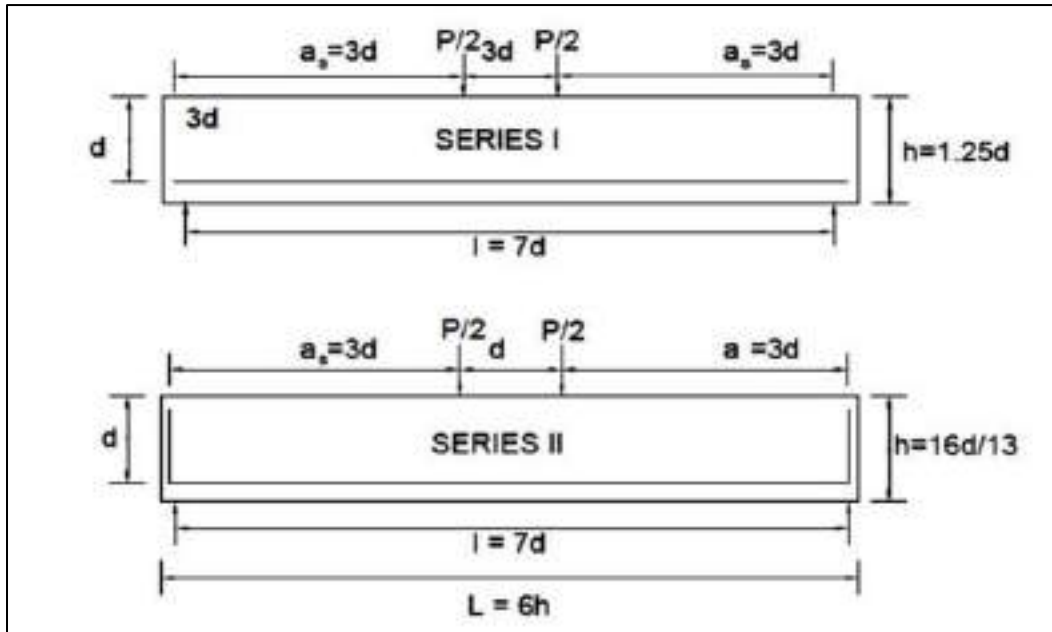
Test Specimen Geometry (1 in. = 25.4 mm).
